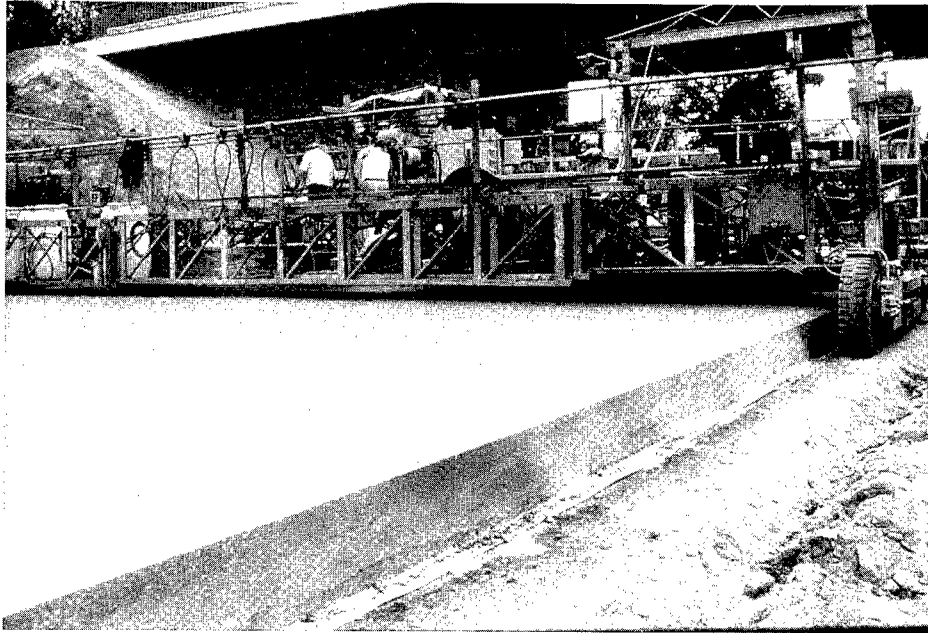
Fresh concrete pavement directly behind finish paver. Note zero-slump, sharp corners of slab.
